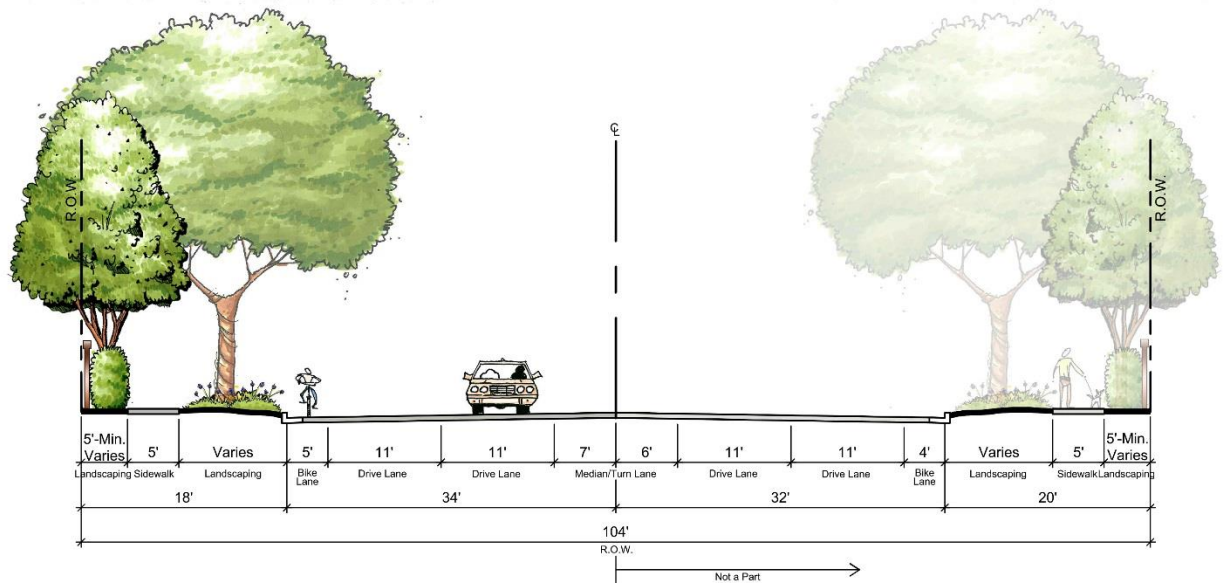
104' South Main Street Section North of the East/West Collector
